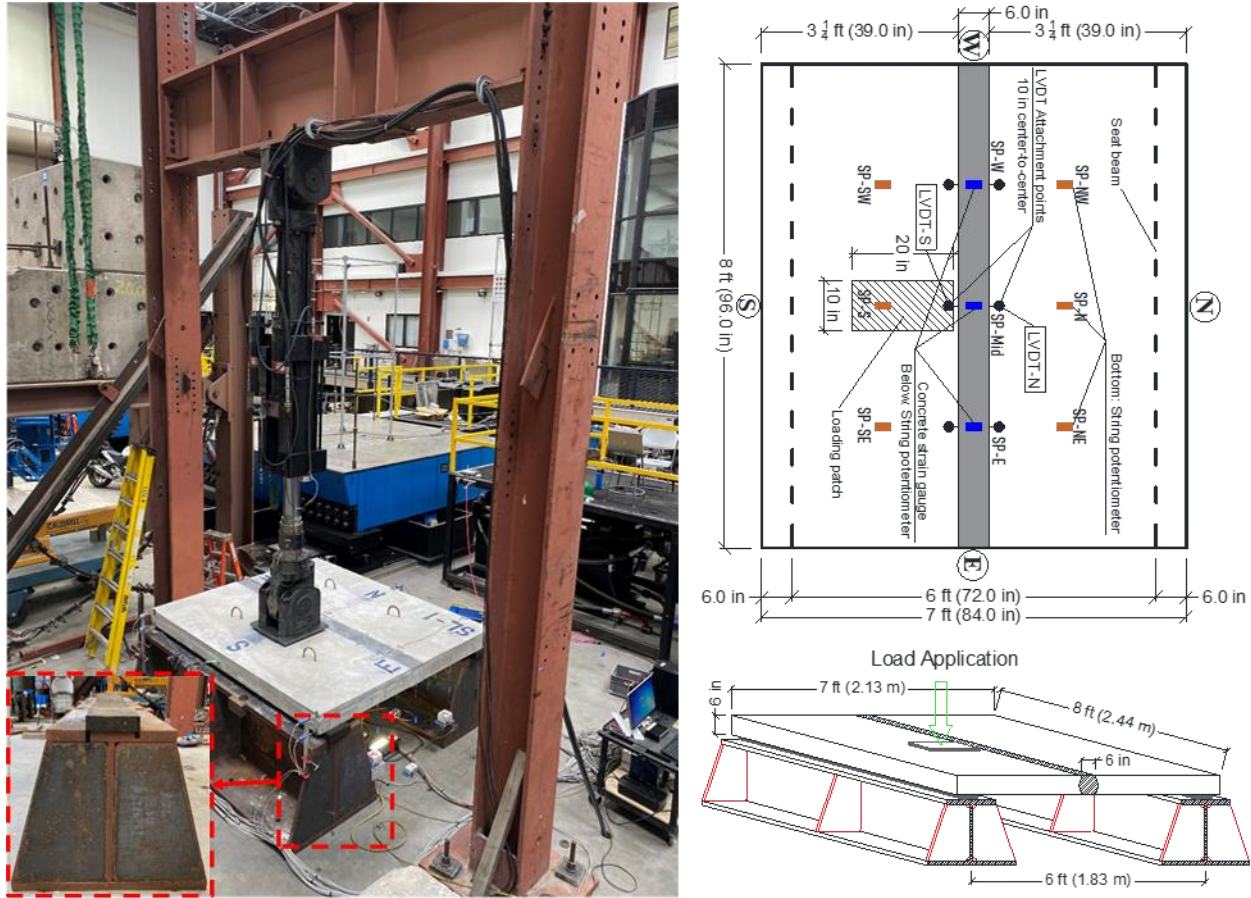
Photograph and schematic drawing of the test setup (1 in = 2.54 cm, 1 ft = 30.48 cm).
